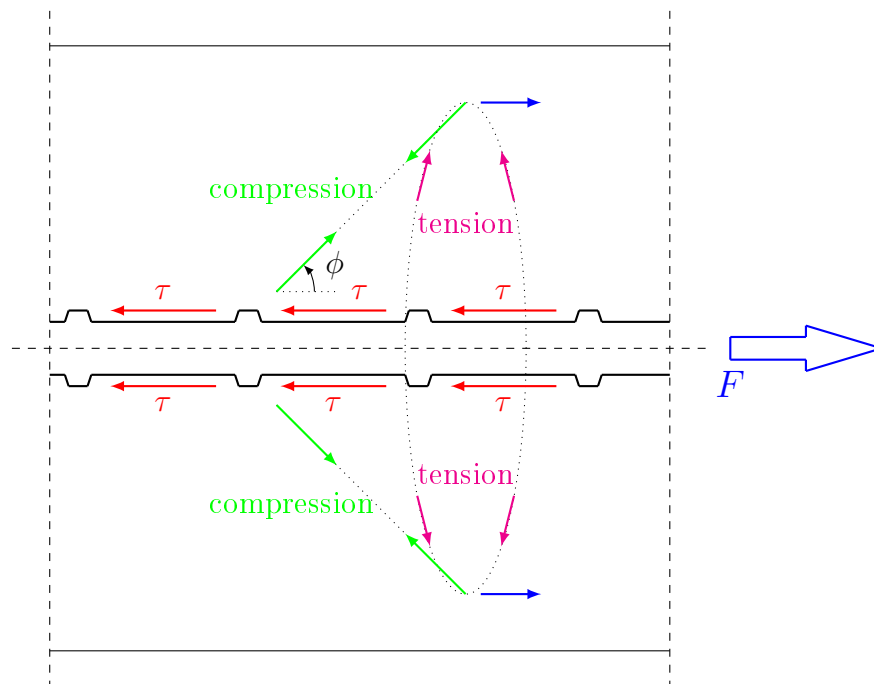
Distribution of forces in concrete around rebar during pullout bond reduction
